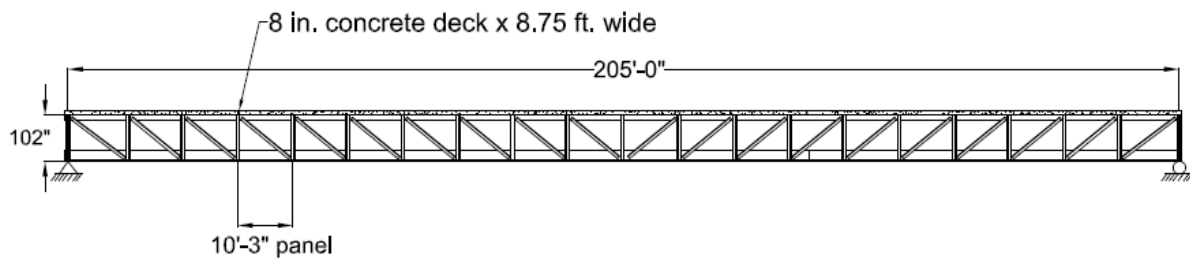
205 ft. Bolted/Welded Steel Truss Elevation View
